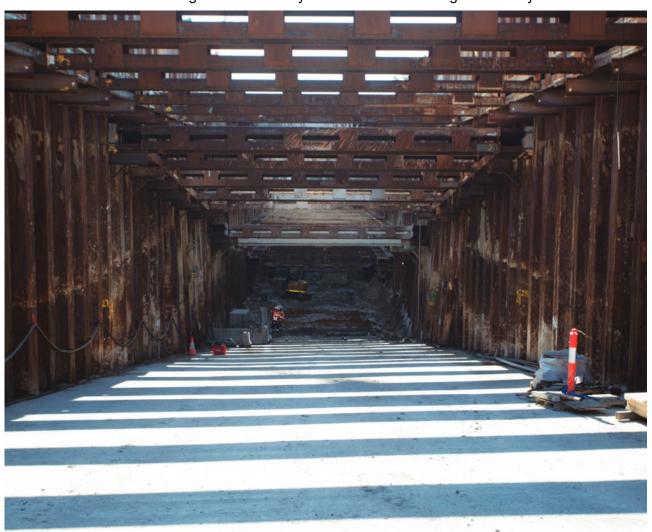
Example tunnel access decline (Arncliffe, 2017)
